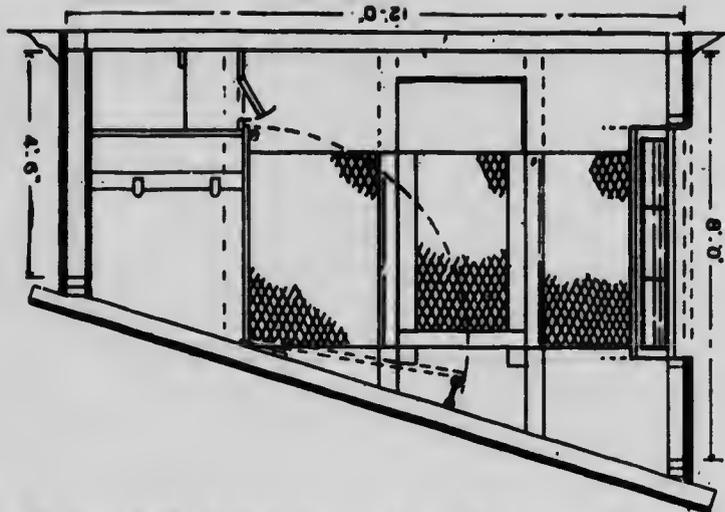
CROSS SECTION OF SINGLE STYLE OF POULTRY HOUSE.
